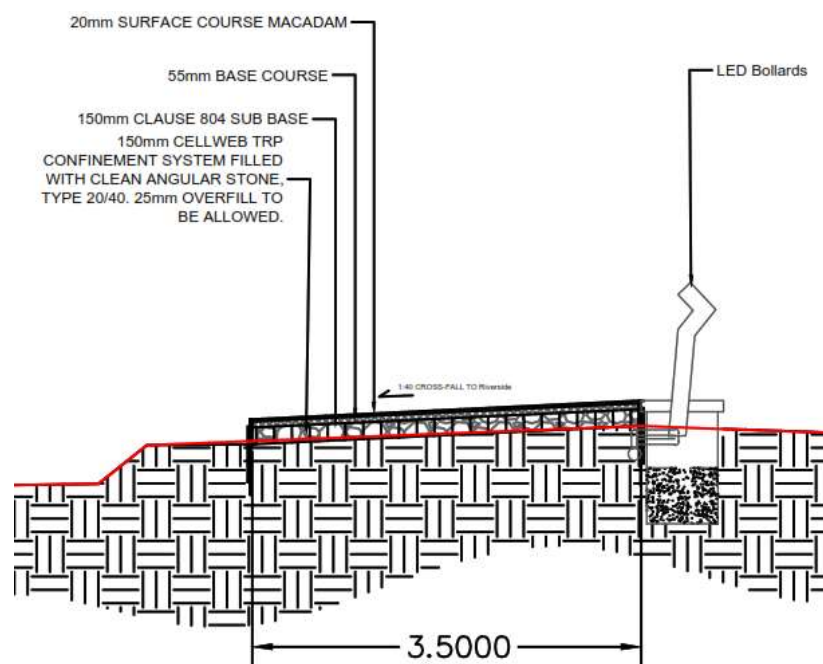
Proposed tarmac path and public lighting north of Kilmurray Student Village
